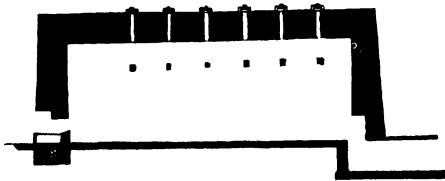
Longitudinal section of "Newcastle" kiln.
